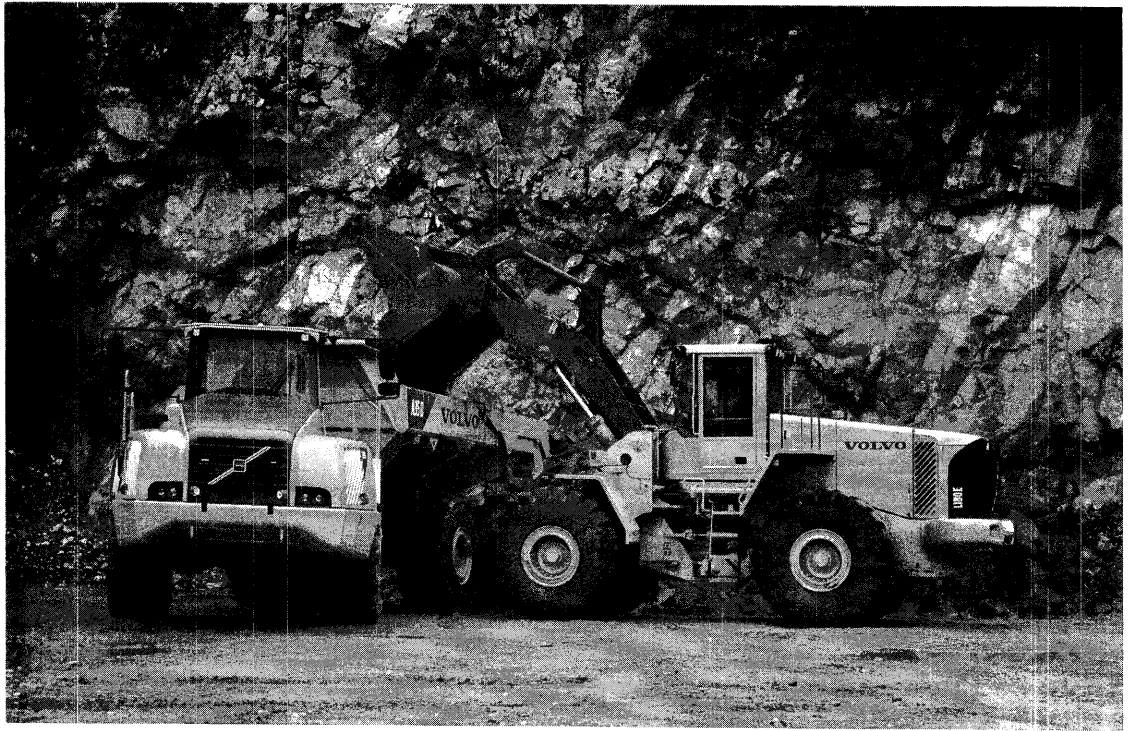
Articulated wheel loader with articulated hauler. (Courtesy of Volvo Construction Equipment North America, Inc.)
